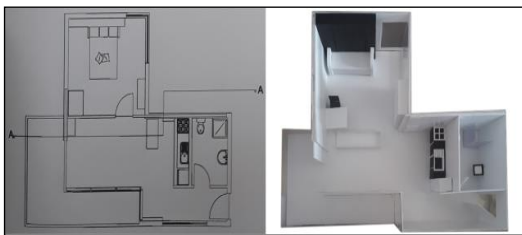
Plan and top view of the example house of Student Group 33 – Flexibility.
